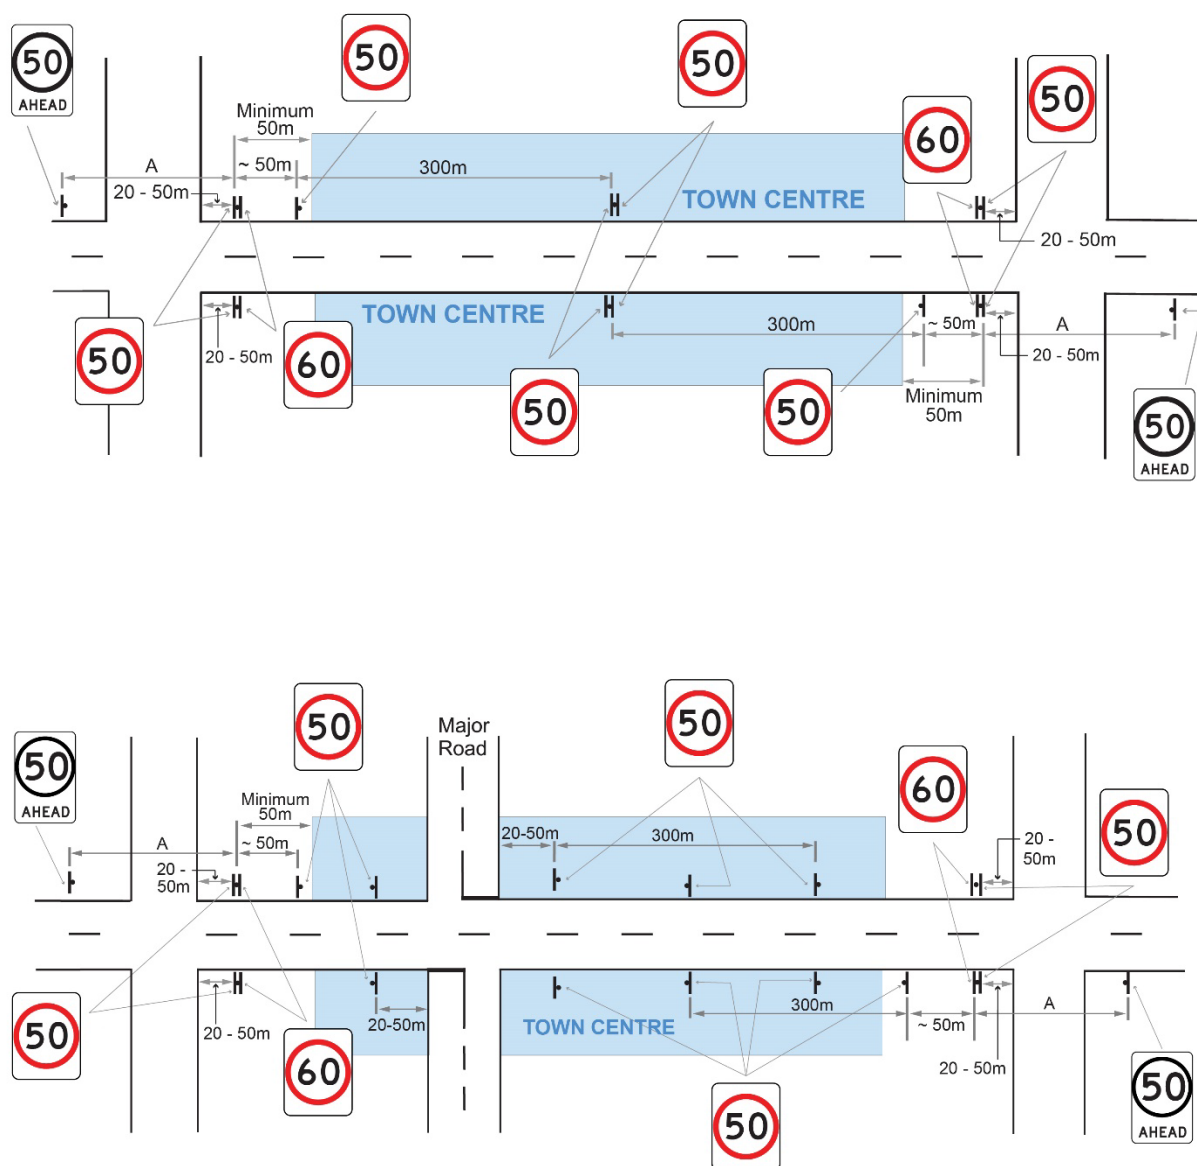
Typical signing layouts for 50 km/h rural and outer metropolitan town centres
